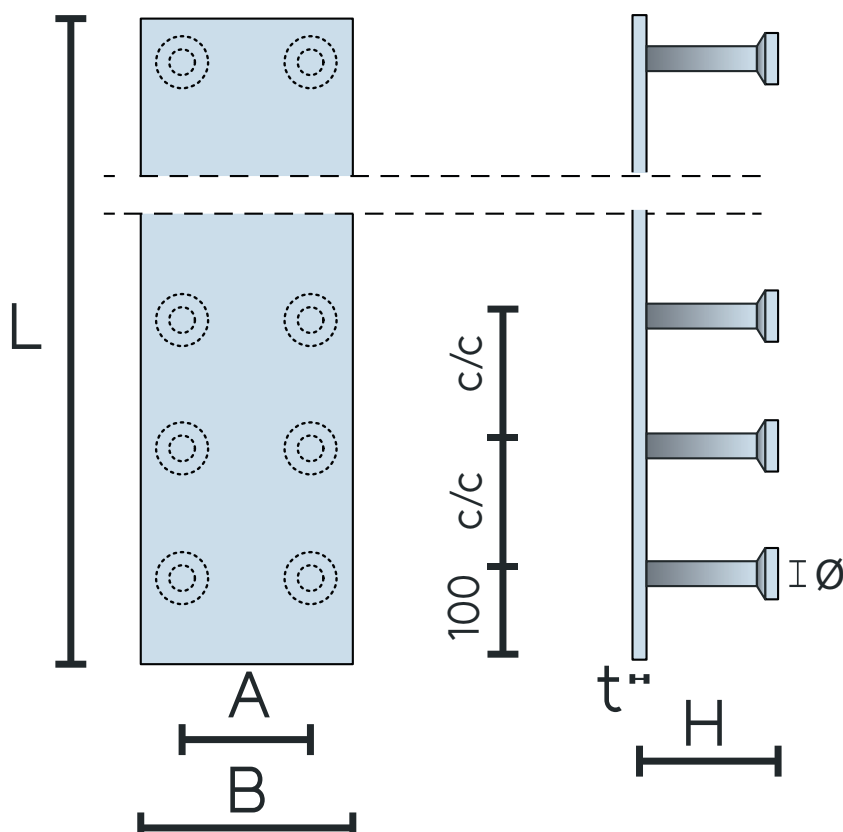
Markings of dimensions for RKL and R2KL fastening plate
